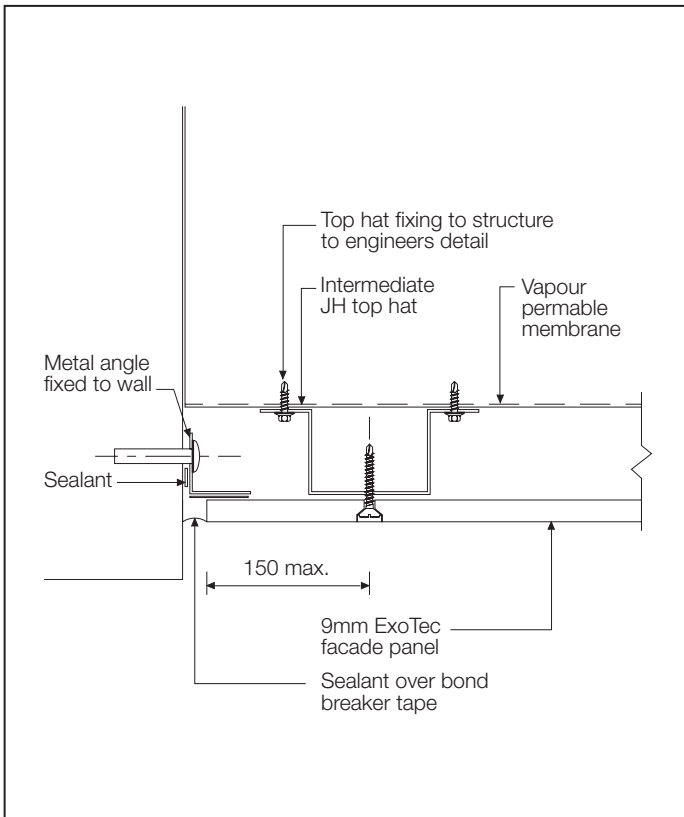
PLAN VIEW: ABUTTING TO A MASONRY WALL
